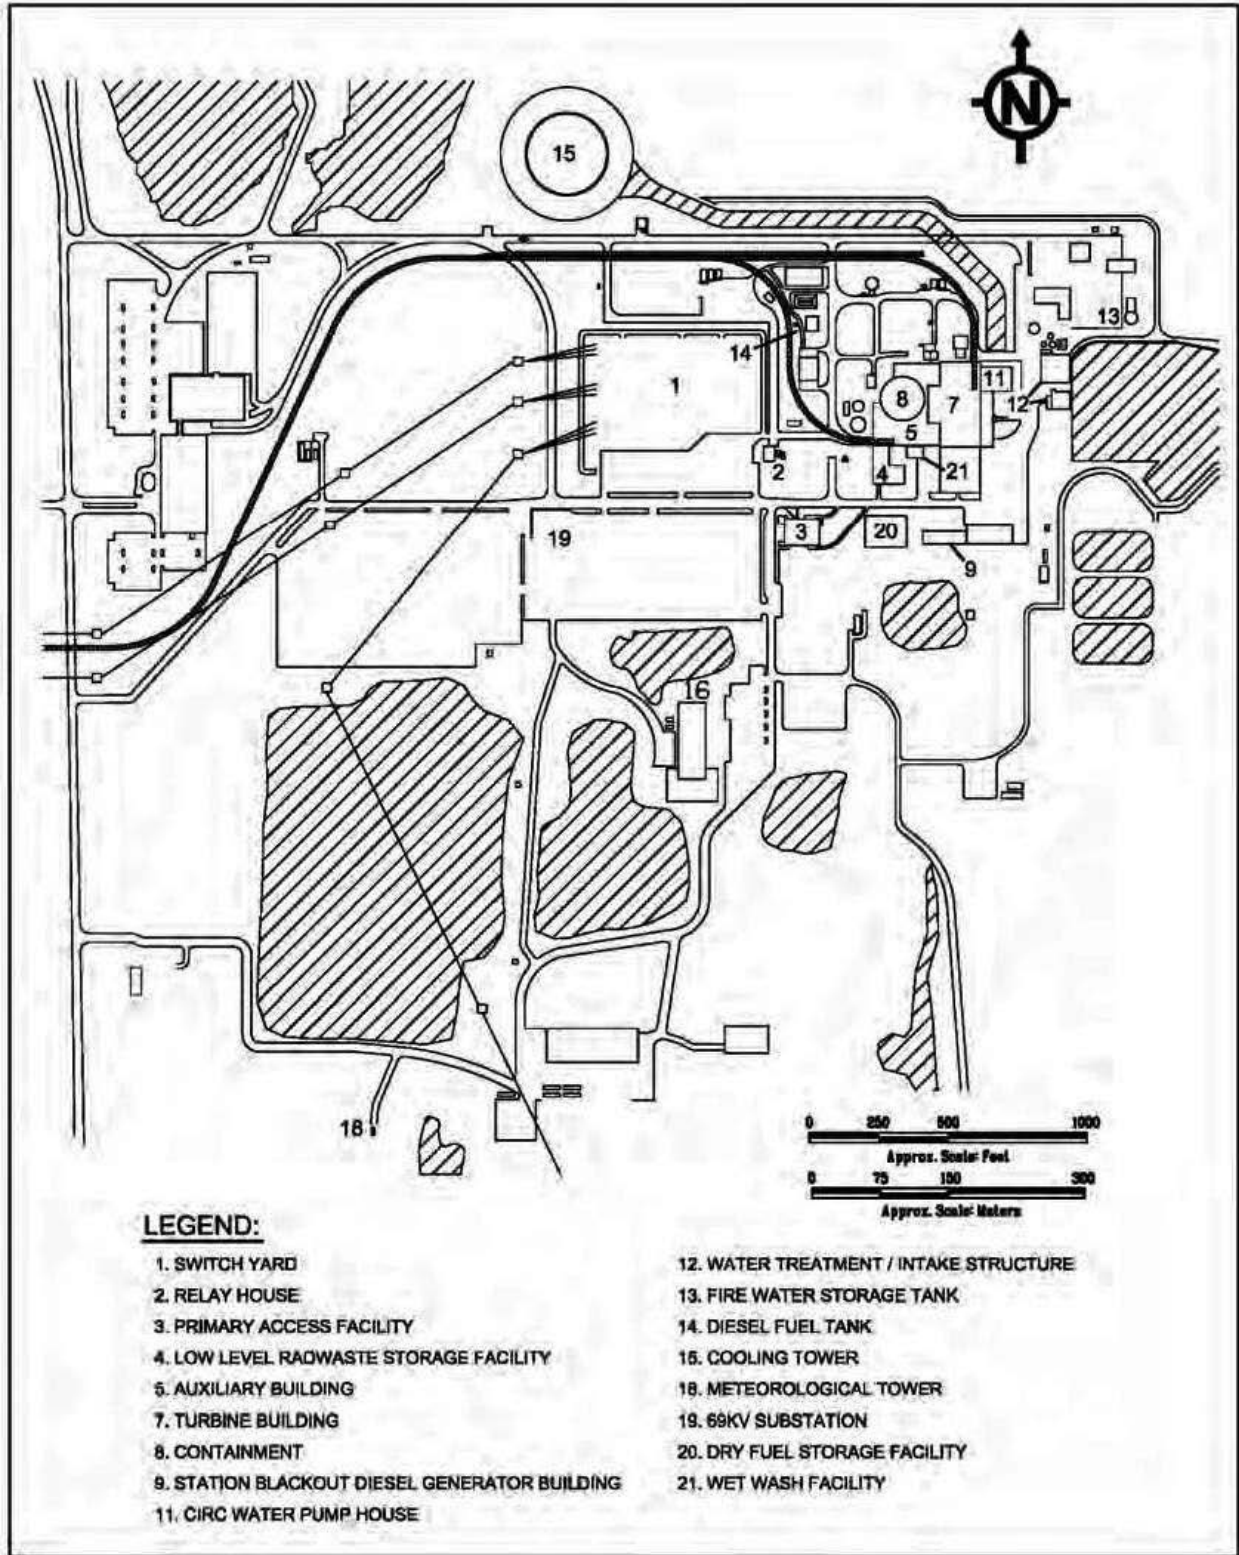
Davis-Besse Site Boundary and Facility Layout
